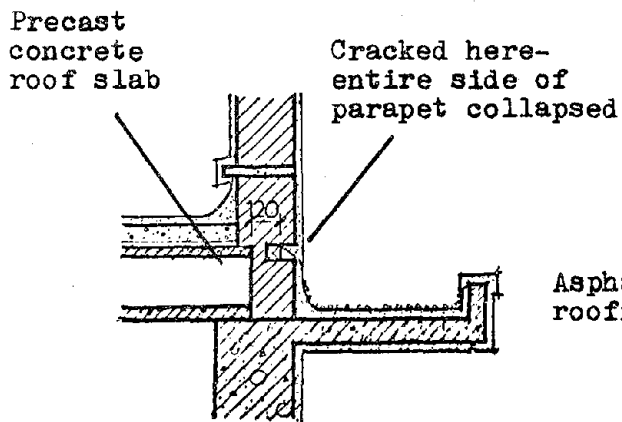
Profile (sectional) of parapet of a residence in Beijing
